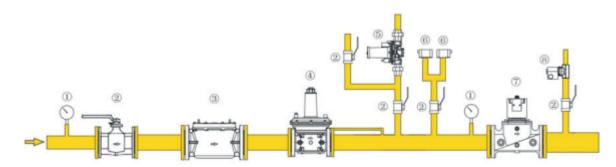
AMR.N Fast opening and closing Gas Solenoid Valve
